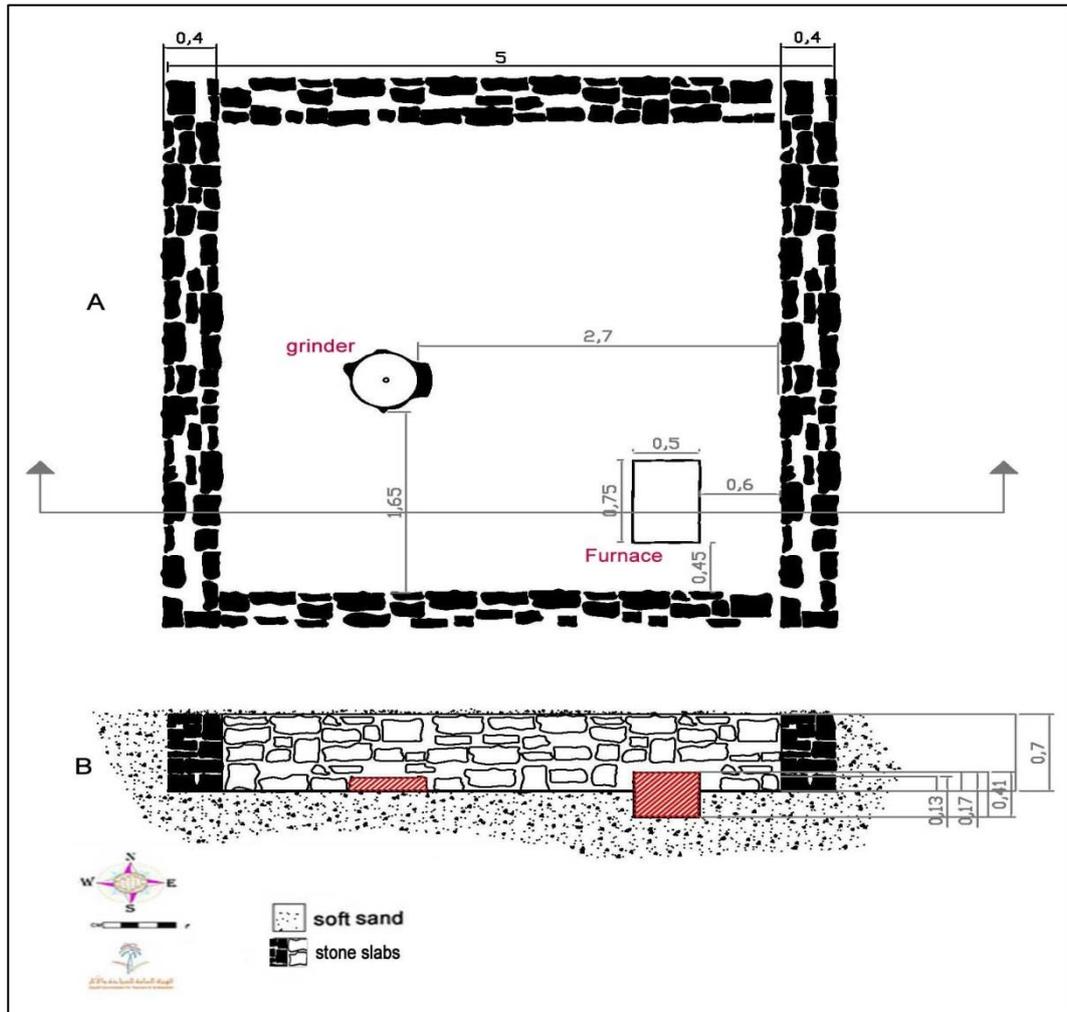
A) Plan of MAS2, B) sketch of the south wall
